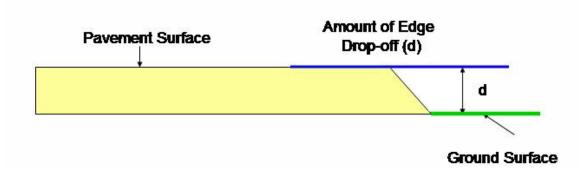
Measurement of Pavement Edge Drop-Off Perpendicular to Pavement Surface
